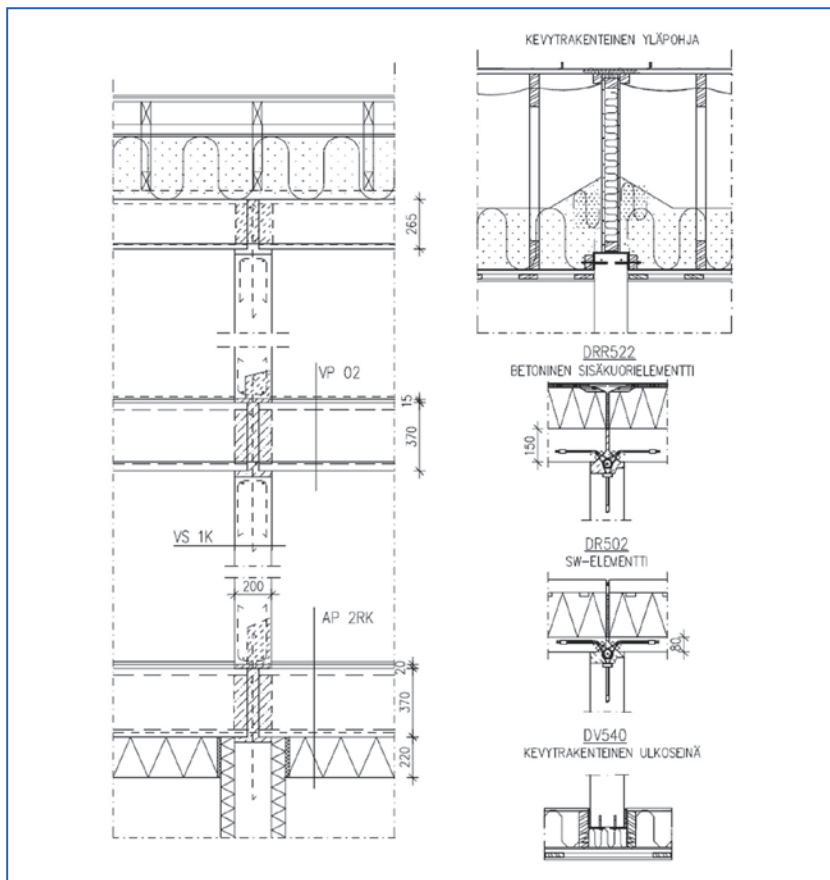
Structural system in terraced housing with 200 mm concrete walls between dwellings with adjoining 370 mm hollow-core slabs [1].
